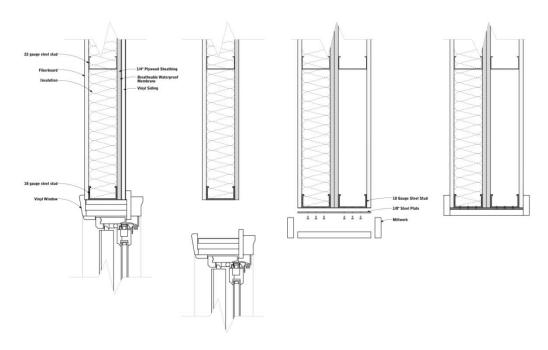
Wall connection detail between base component and expansion component. From left to right 1) The base component window detail in plan, 2) Separating the window from the wall, 3) Joining the expansion component wall to the base component 4) Finishing millwork
